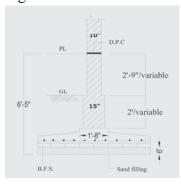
Strip footing constructed by continuous brick wall and continuous footing
